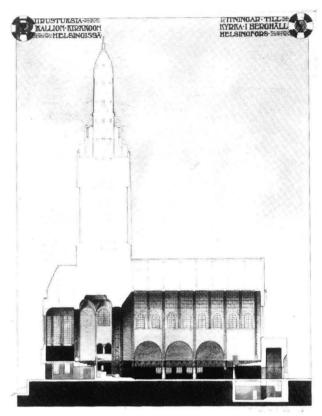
Main drawings, section towards the west. (Original and photo as in Fig. 106)
